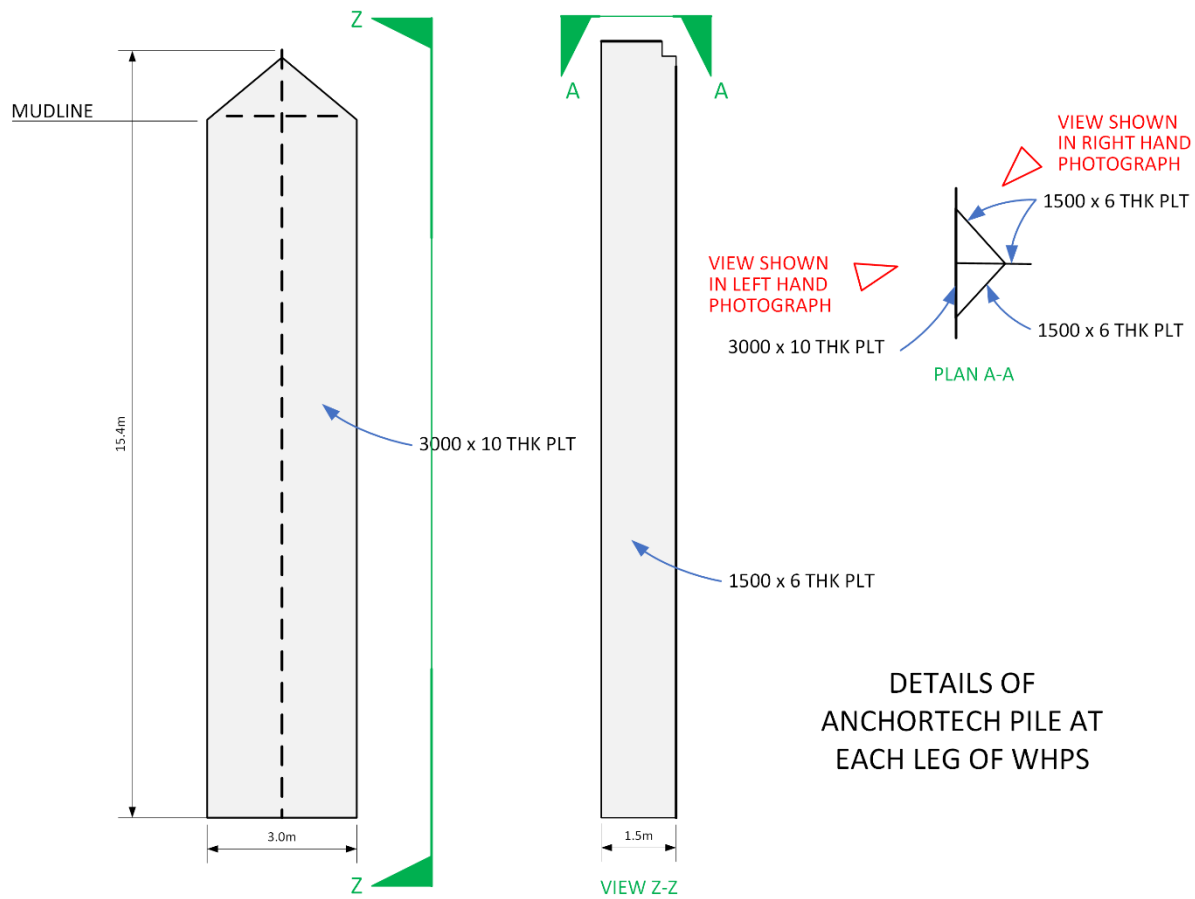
Well P1 WHPS 'Anchortech' piles (4x)
